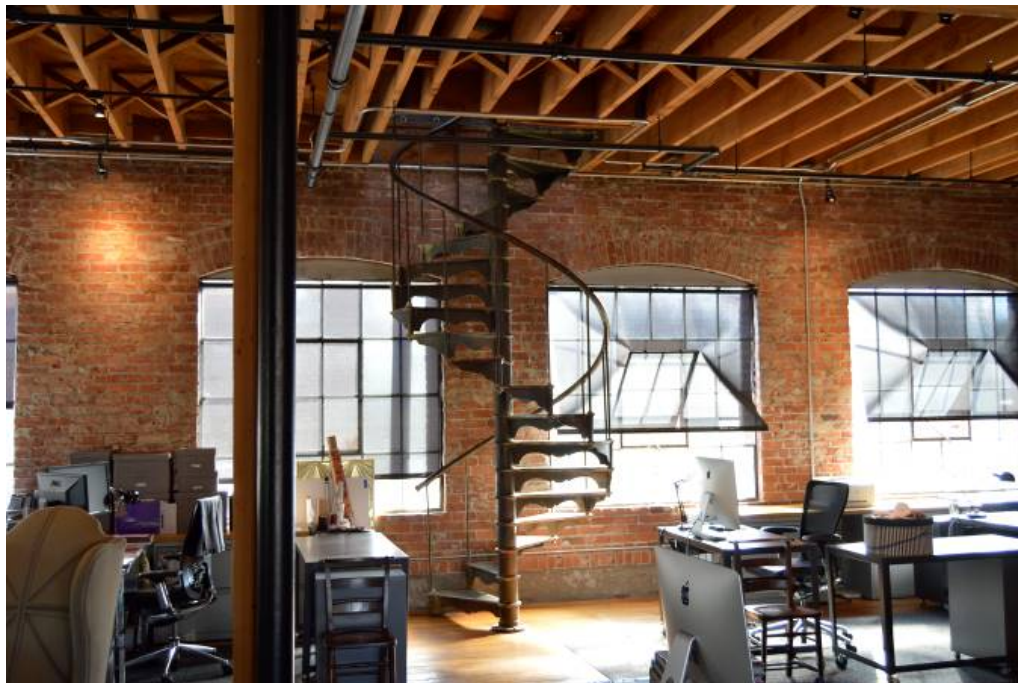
Three steel-sash windows along east facade viewed from third-story interior. Looking east.
